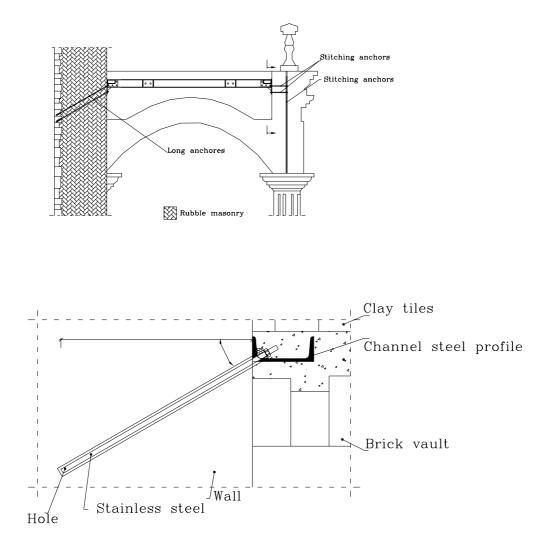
Example of anchoring in Outeiro church, Portugal [29]
